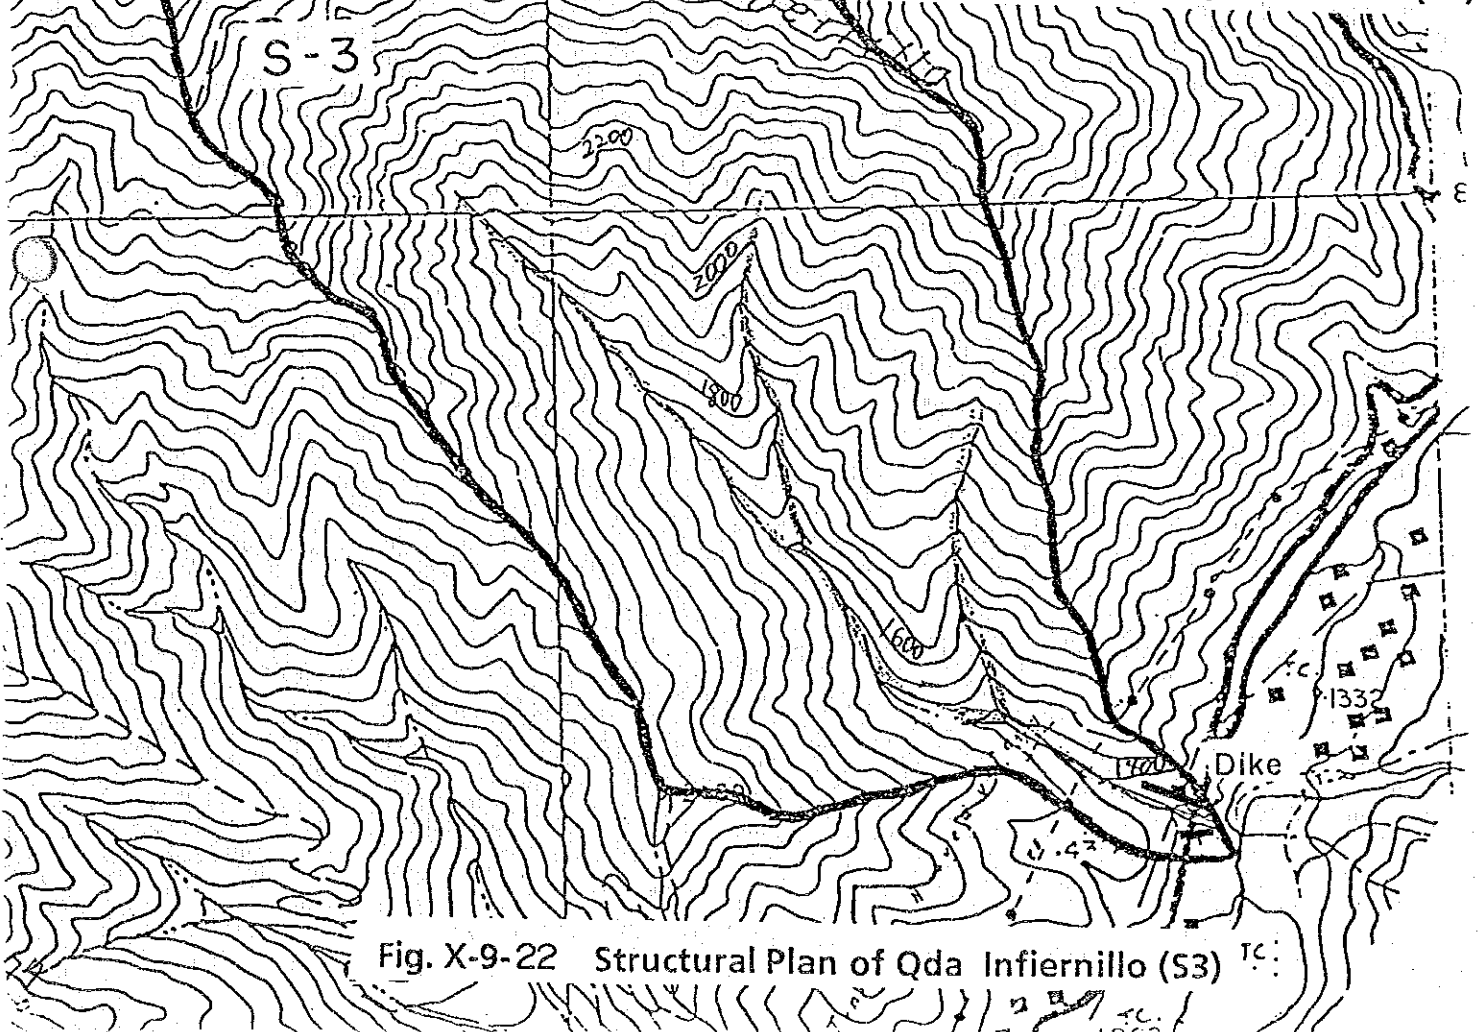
Structural Plan of Qda Infiernillo (S3)
